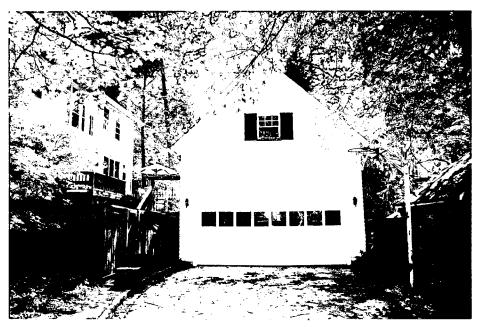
PHOTOS & KEY PLAN EXISTING FRONT & SIDE
